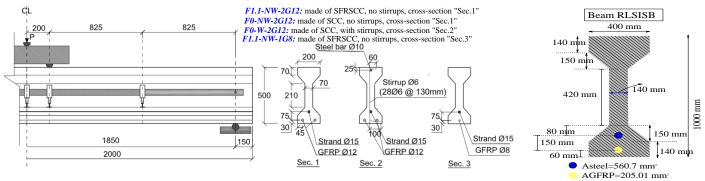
Configuration and test setup of the beams (dimensions in mm).
